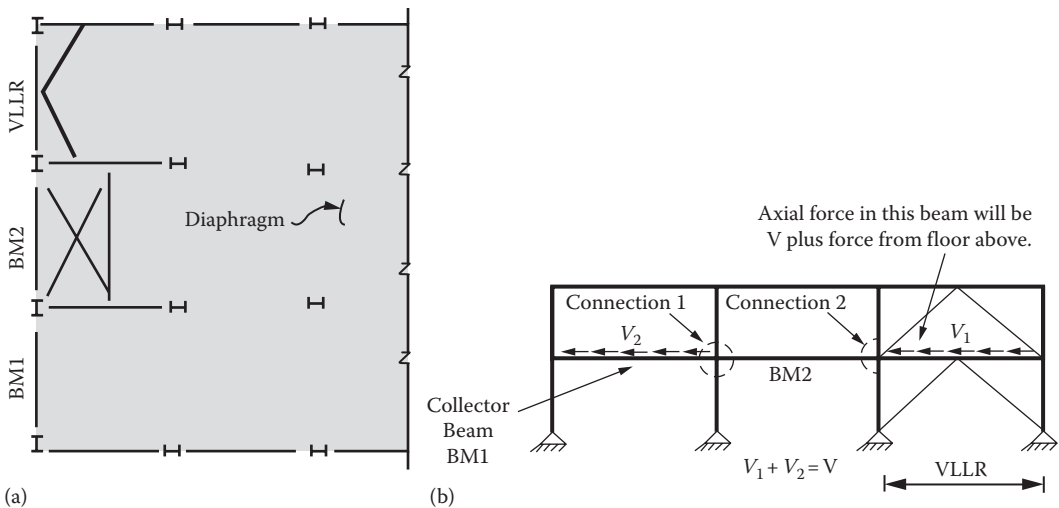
Diaphragm with opening along drag beam, approach 2: (a) plan and (b) elevation. *Note:* (1) Beam BM2 does not collect diaphragm shear forces but must be designed to carry the axial force V_2 , (2) provide connection between diaphragm and collector beam BM1 to transfer diaphragm force, and design collector beam for this force. (3) Connections 1 and 2 must be designed to carry the axial force V_2 through the beam–column connection.
